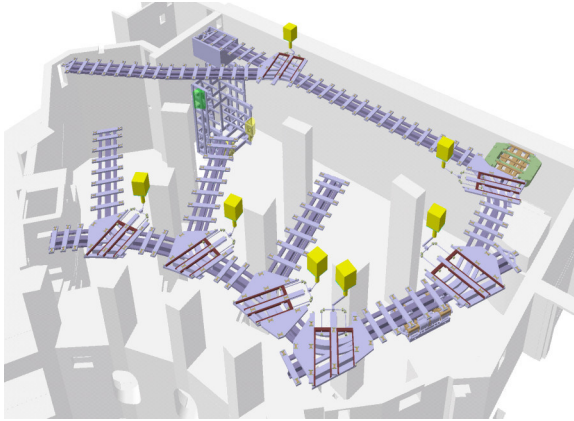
Monorail crane layout (image courtesy of CCFE)
